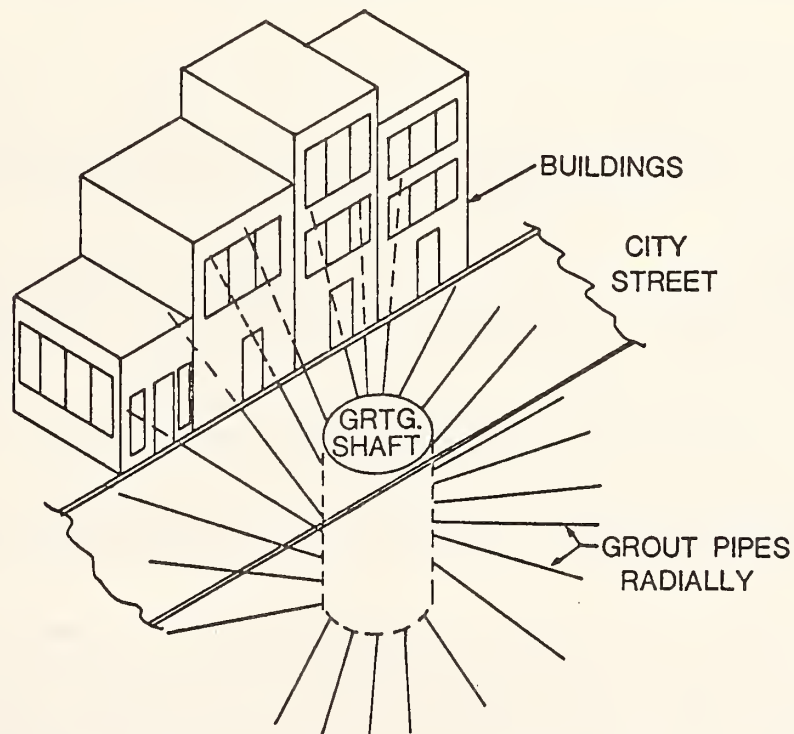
Schematic of grouting for Metro system in Hanover, Germany
